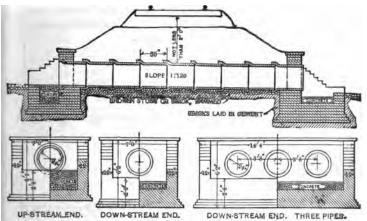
Standard Vitrified-pipe Culvert. Plant System. (1891.)
